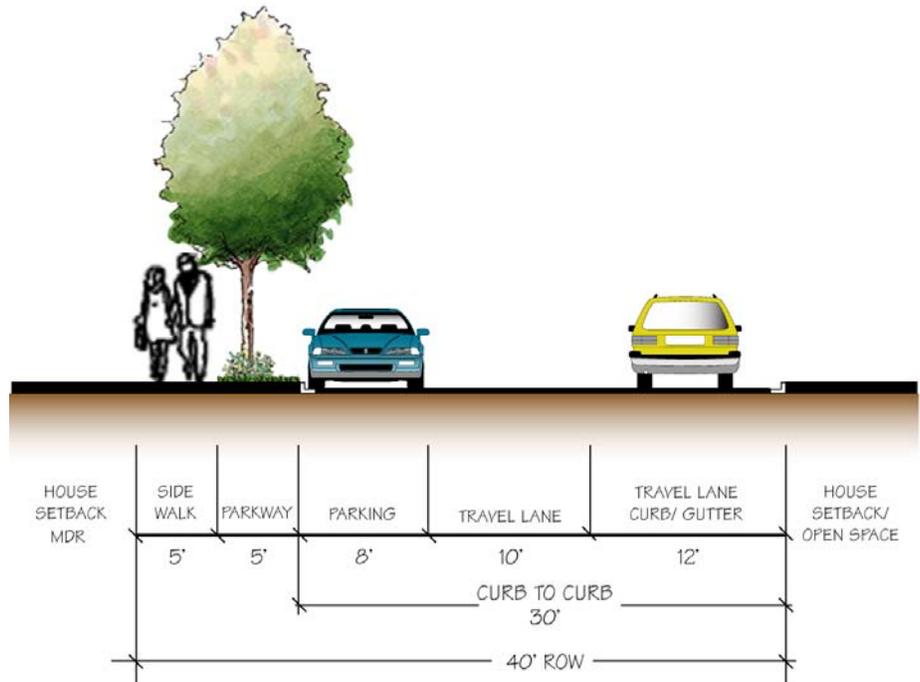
Streets A, B, and D (Section D-D from Figure 5-1)
